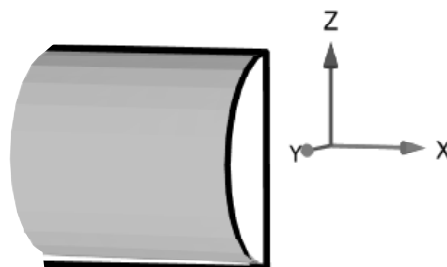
Visualisation of the deformed shape of the shield of the TBM by the excavation of the shallow tunnel (scaled up to 50 times; HS model, grouting variant I).
